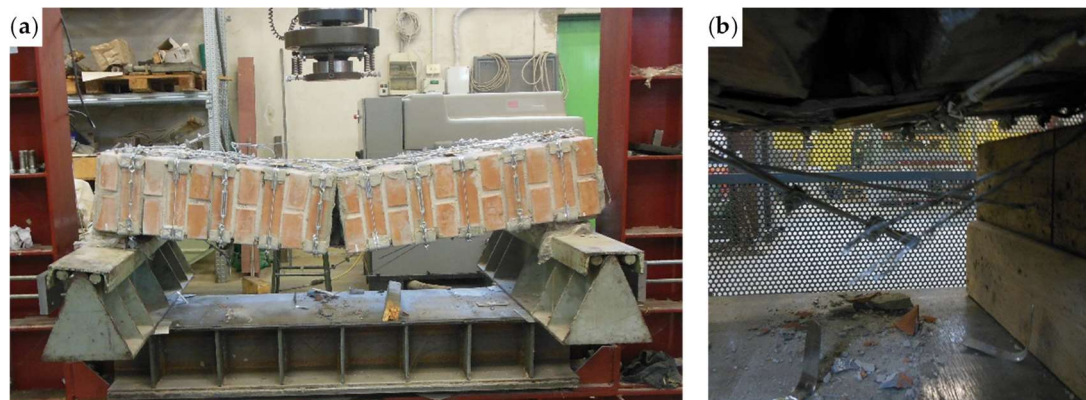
The specimen on the testing machine after the test: (a) front view and (b) detail of the broken straps under the middle cross-section (back view).
